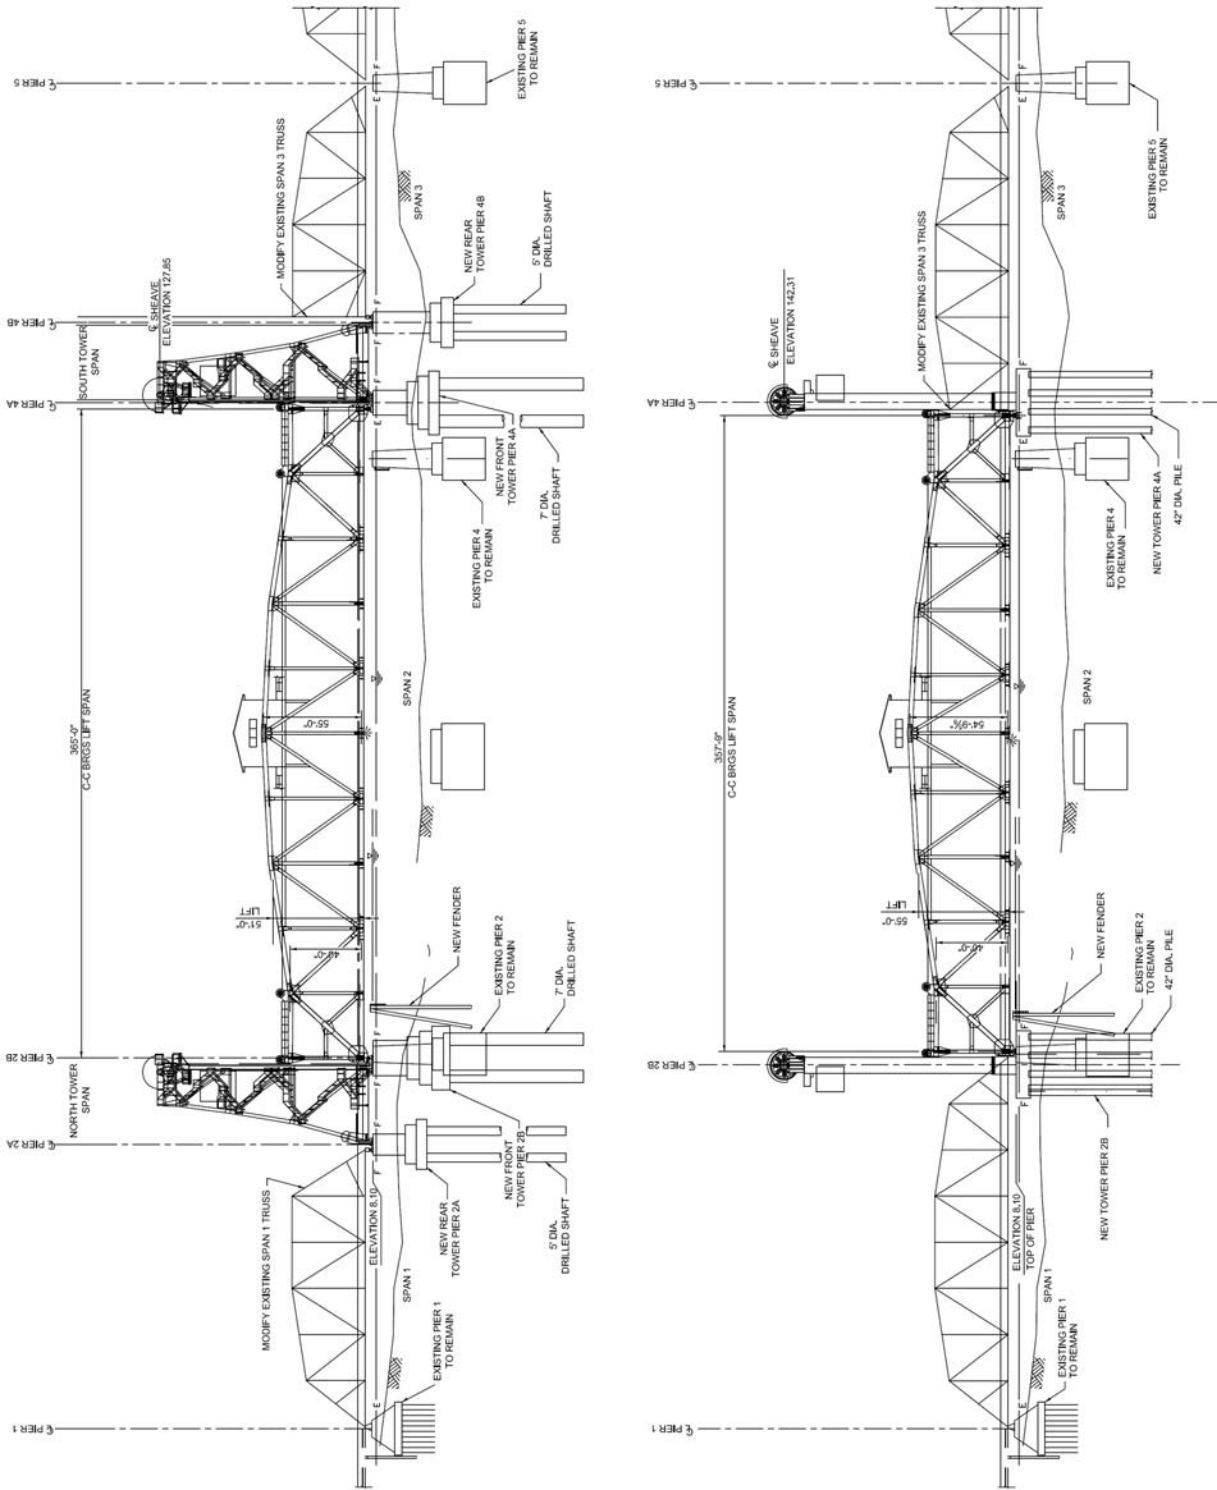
Elevation view of original design layout (Top) and final design layout (Bottom).
